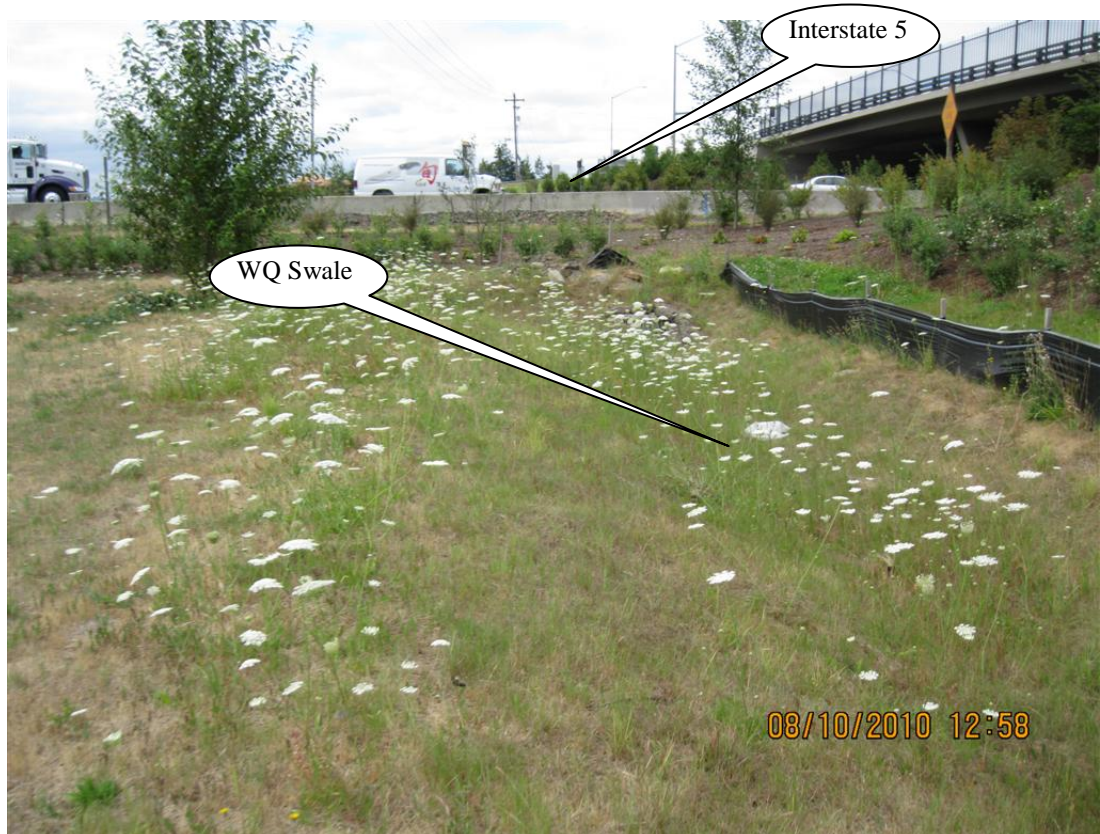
WQ Biofiltration Swale looking west. I-5 is located in the background.
